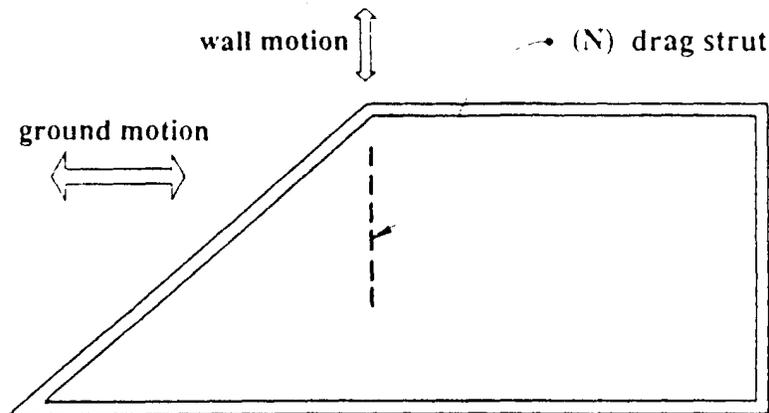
Horizontal or Plan Irregularities -- Example of Strengthening a Split Level Diaphragm
